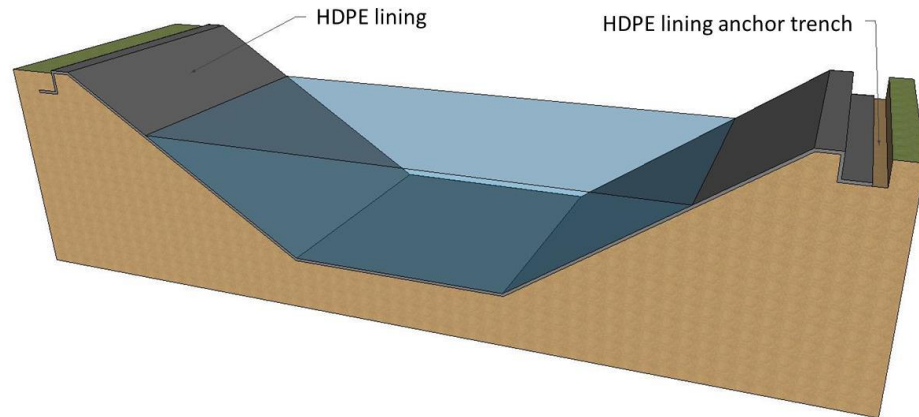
E67 Canal membrane-lined section: beginning of first fill.
